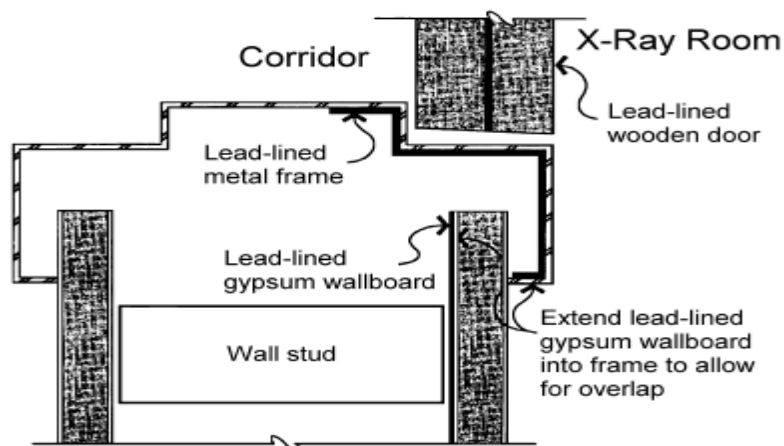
Cross-sectional view of lead-lined door and frame illustrating the proper placement of lead shielding. When the thickness of the metal in the door frame is inadequate, the inside of the frame should be lined with a single lead sheet and worked into the contour of the frame to provide an effective overlap with the adjoining barrier.
